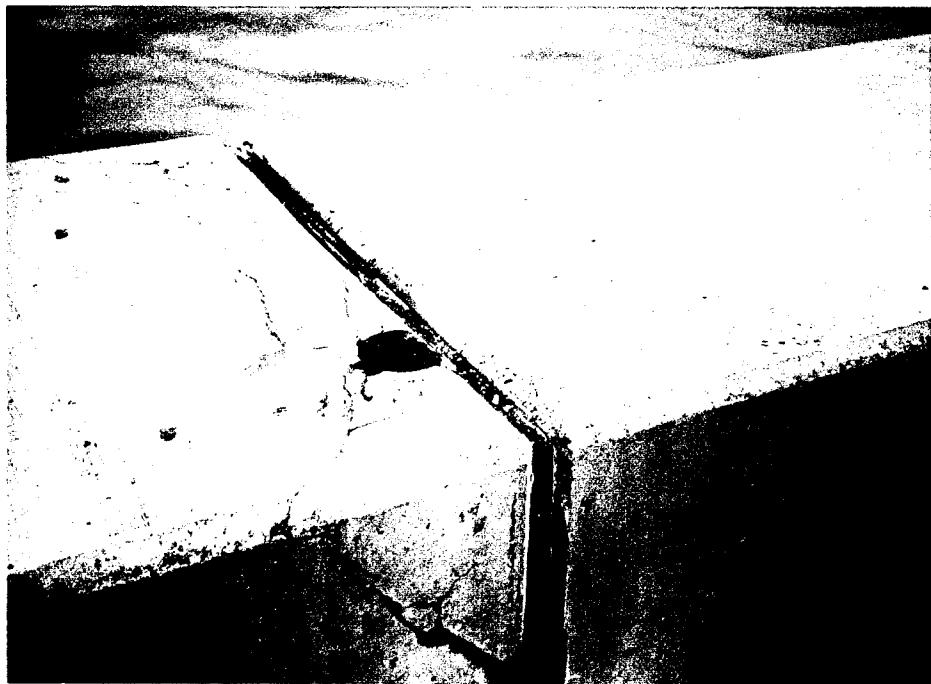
Cracking at joint 9/10, north seawall monolith N10
